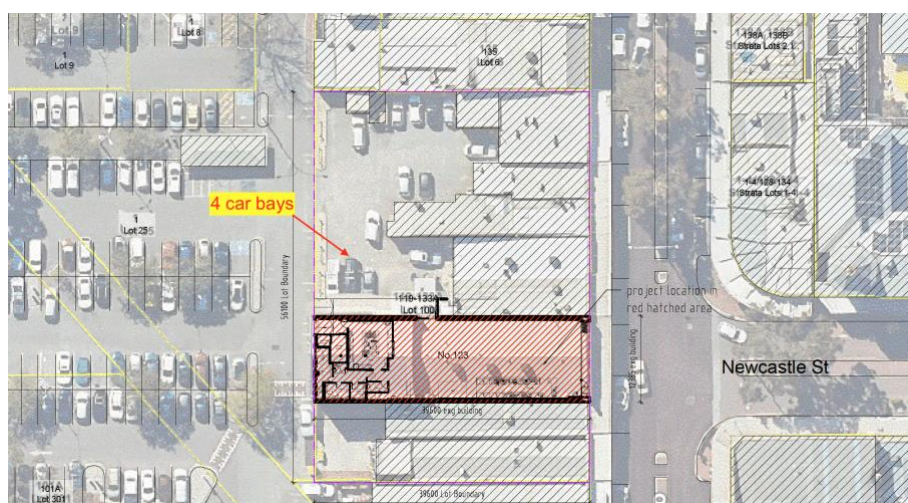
Aerial View of the Proposed Site and Staff Parking Bays
